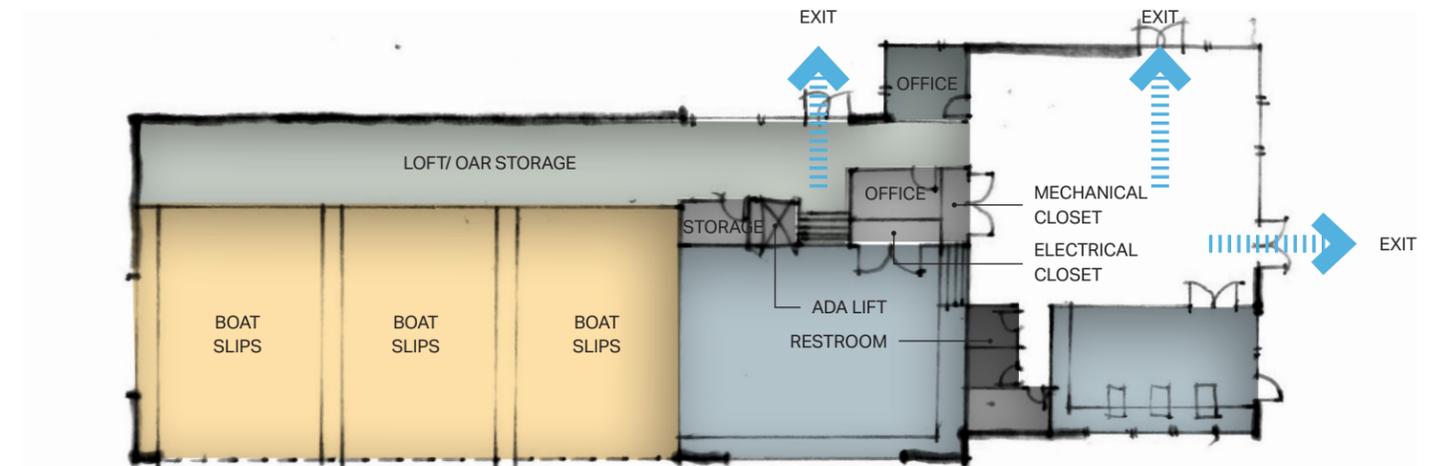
PROPOSED BOATHOUSE OPTION 3 - GROUND FLOOR
